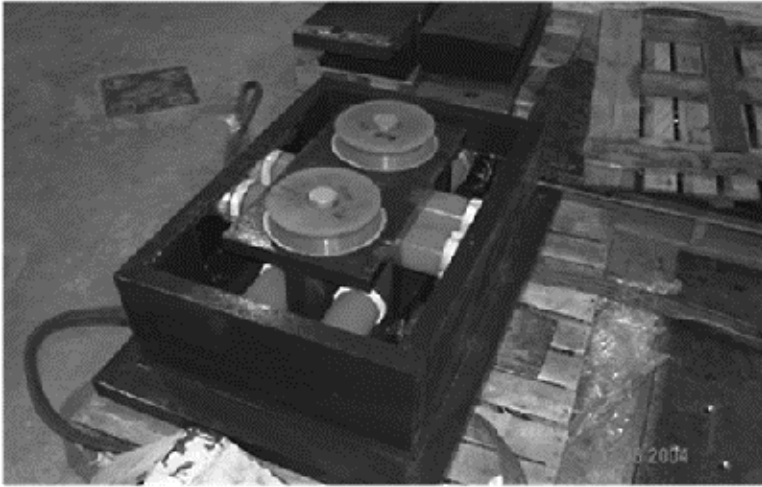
Load elements and MER on the pedestrian bridge SIB.
